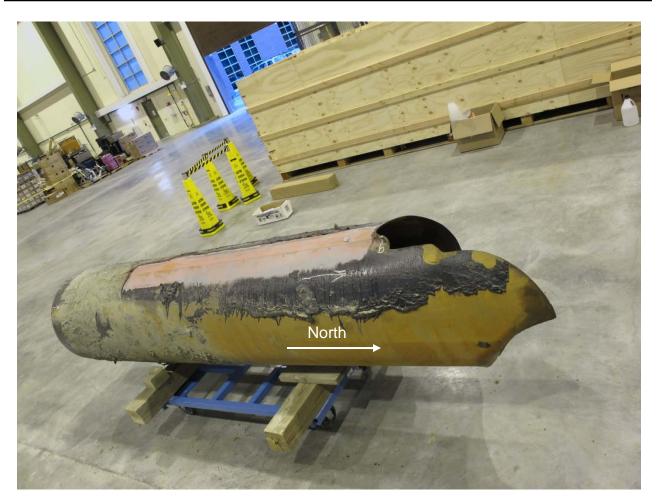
Condition of the southern section of pipe after grit blasting and magnetic particle inspection.
